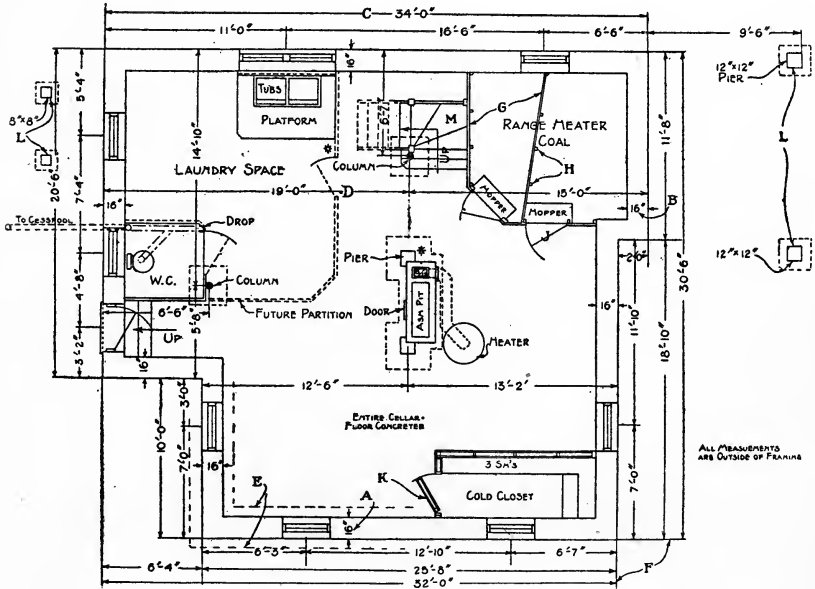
PLAN OF FOUNDATION AND CELLAR—SCALE  $\frac{1}{12}$  IN. TO THE FOOT
